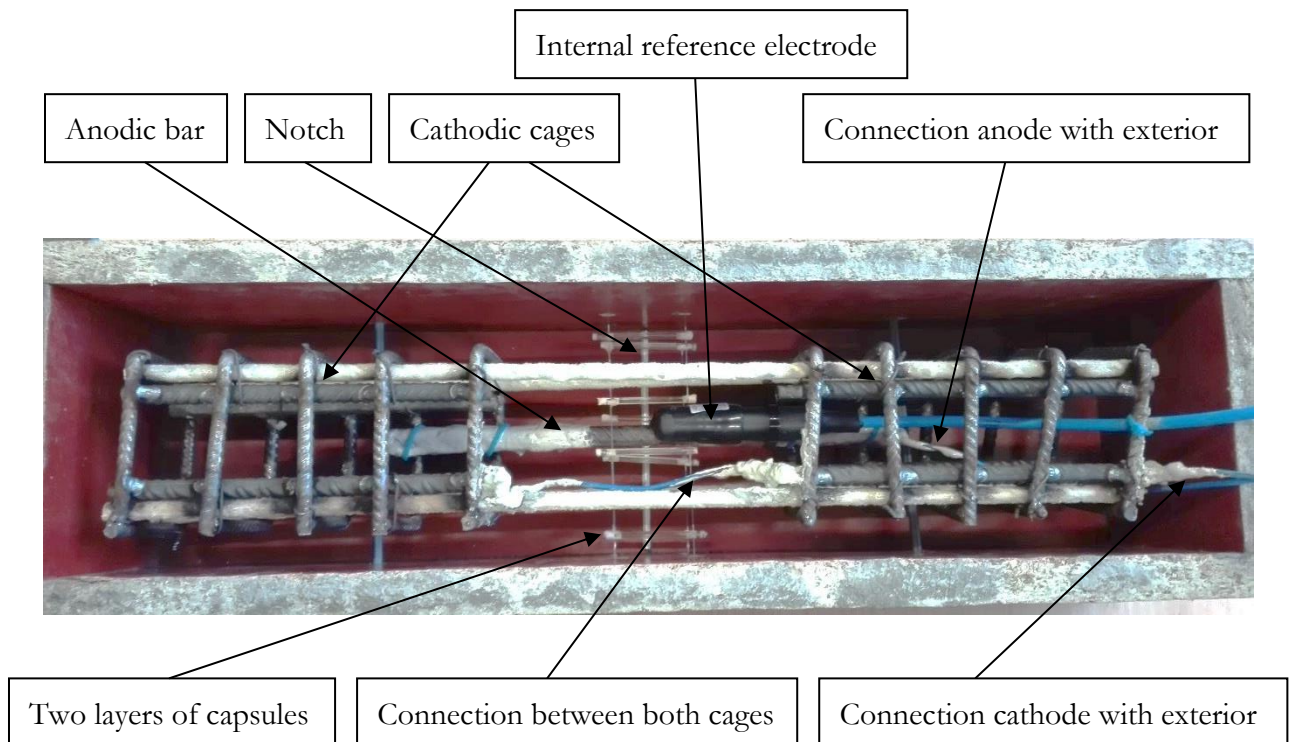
CONCRETE BEAM CONFIGURATION BEFORE CASTING
